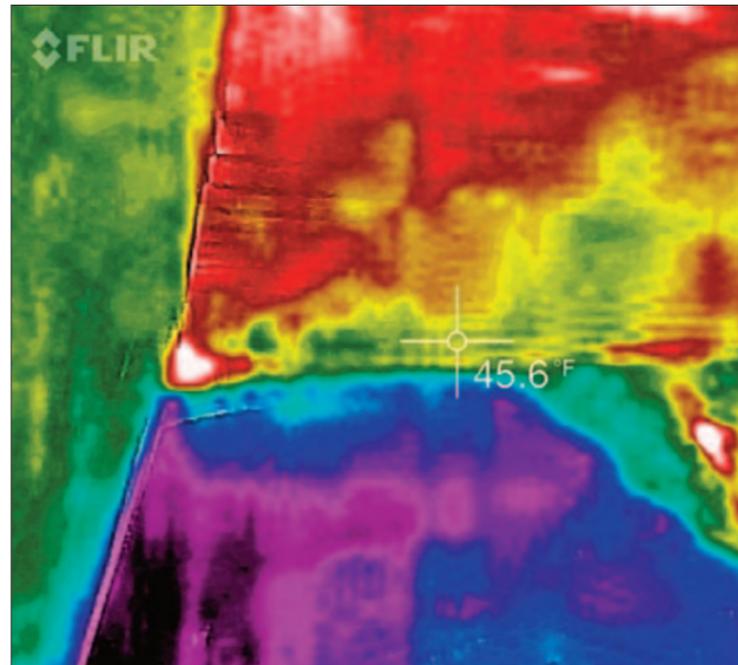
This photo may look abstract, but it depicts the corner area of where two walls adjoin. The colours are showing differences in surface temperature of the walls.
